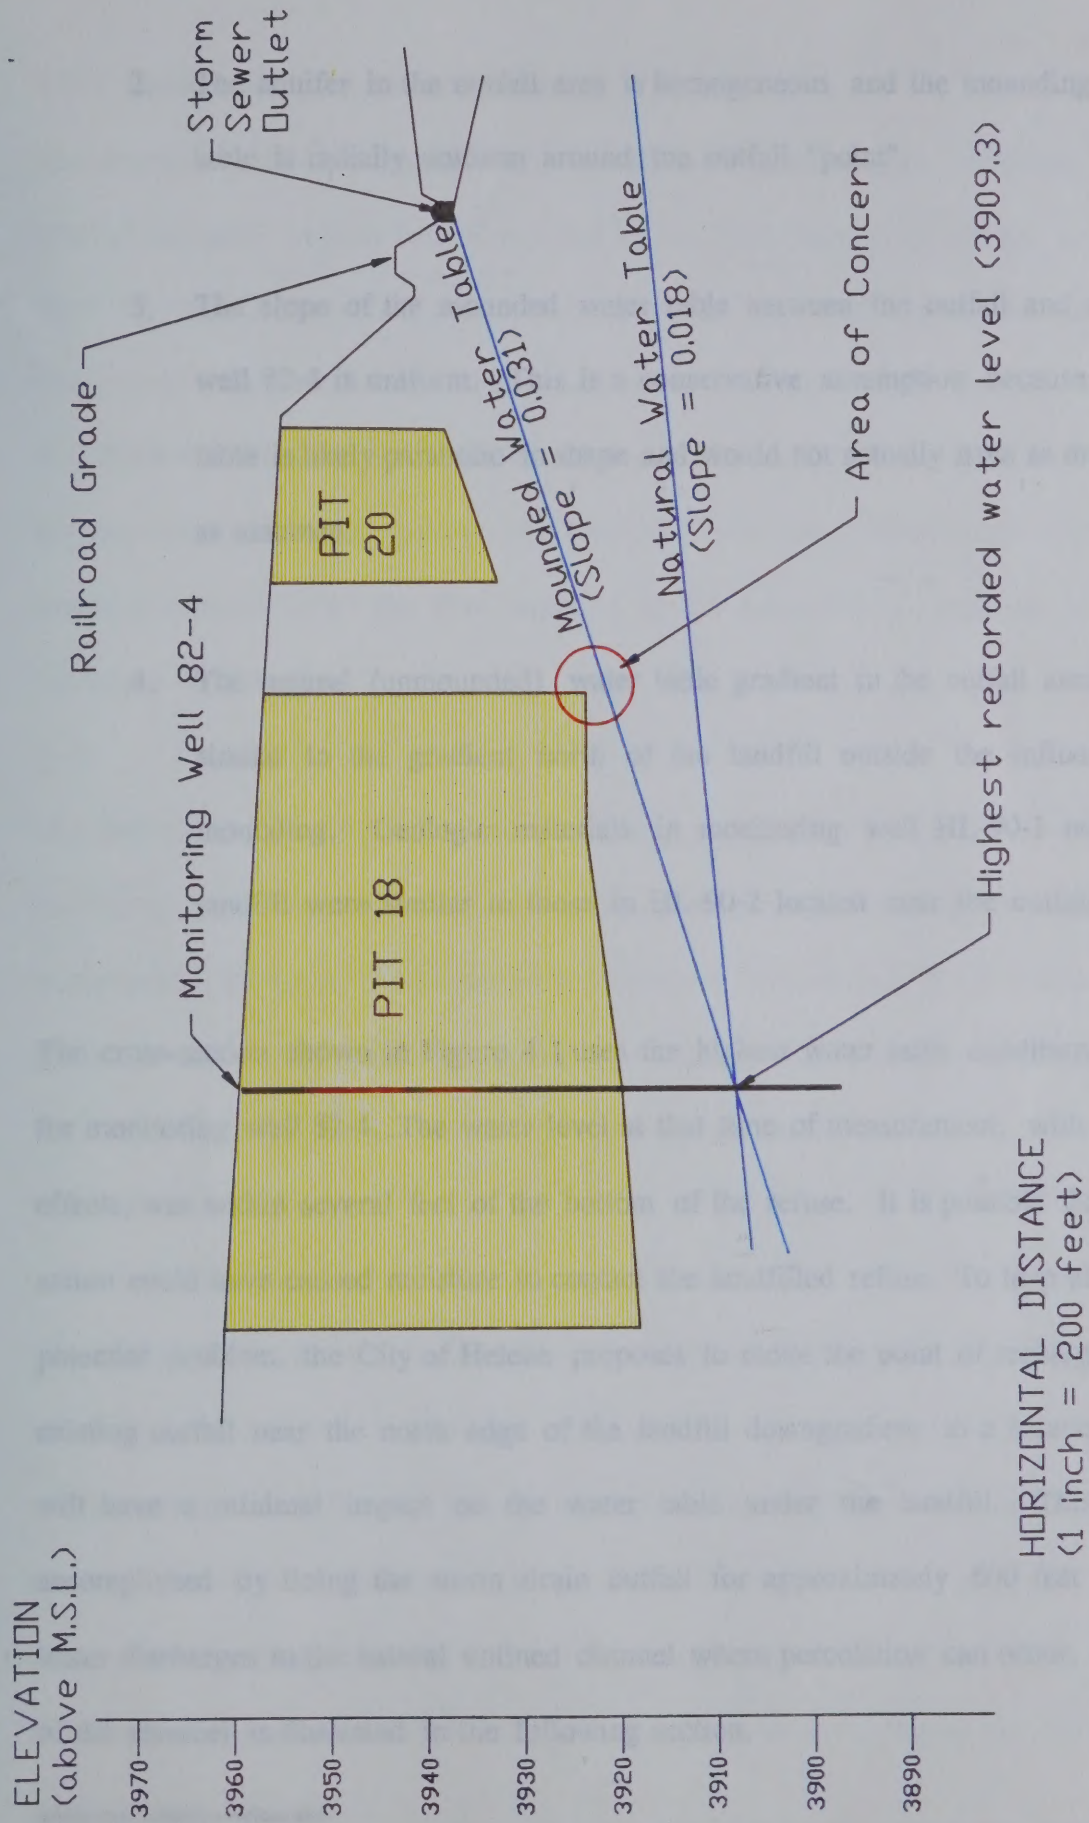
Cross-Section of Storm Sewer Outfall Area
